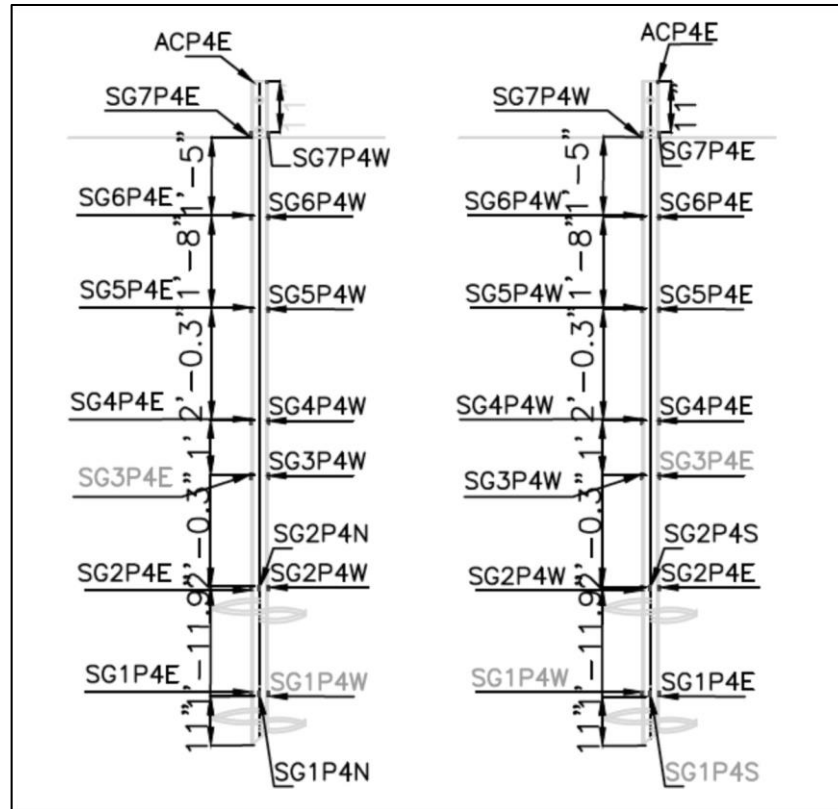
Instrumentation of Double-Helix Pile (North and South Views)
